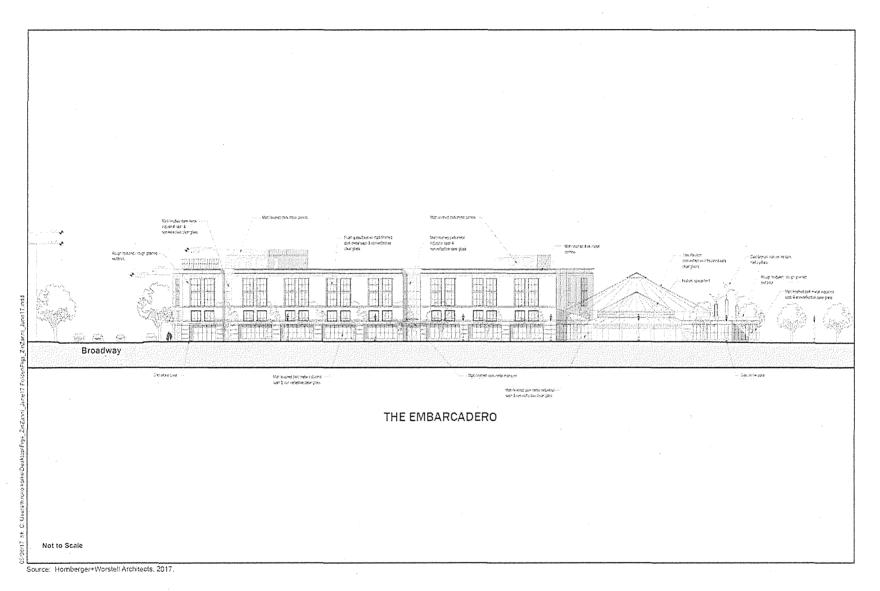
PROPOSED ELEVATION – WEST, THE EMBARCADERO
